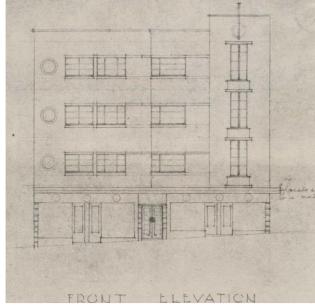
Original architectural drawings for Winston House by Craig & Brindley, 1940 (Source: WMC, BA 40/102)
